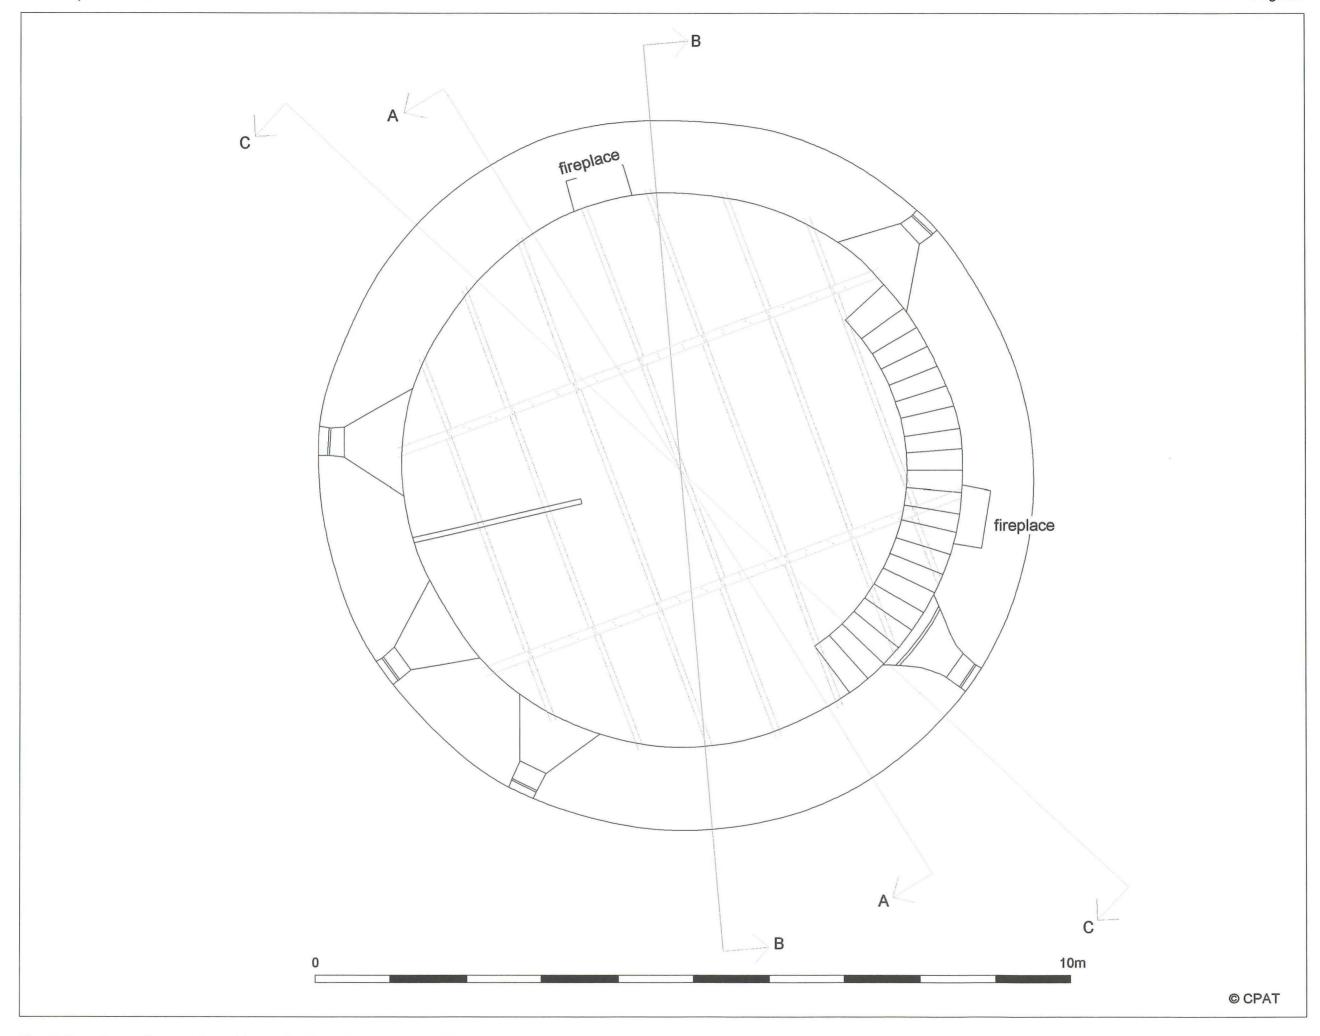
Roundhouse Farm north-east tower, first floor plan showing roof beams
